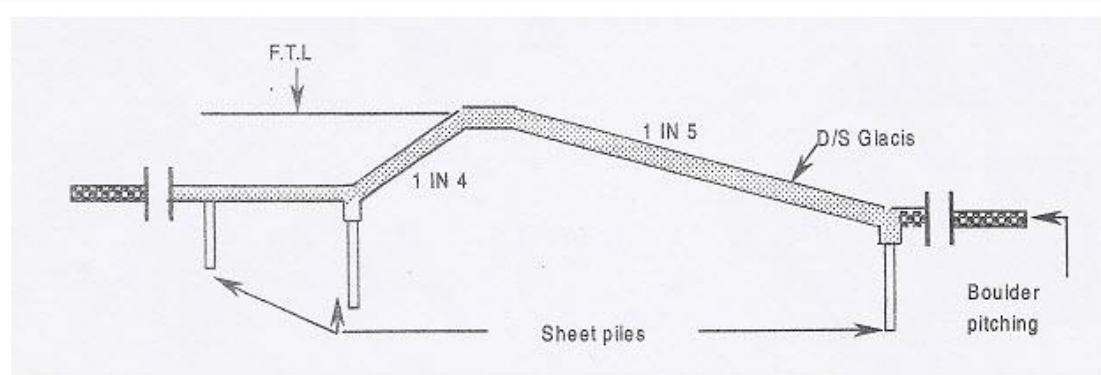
Concrete weir. (Source: Patel and Shah, 2008)
